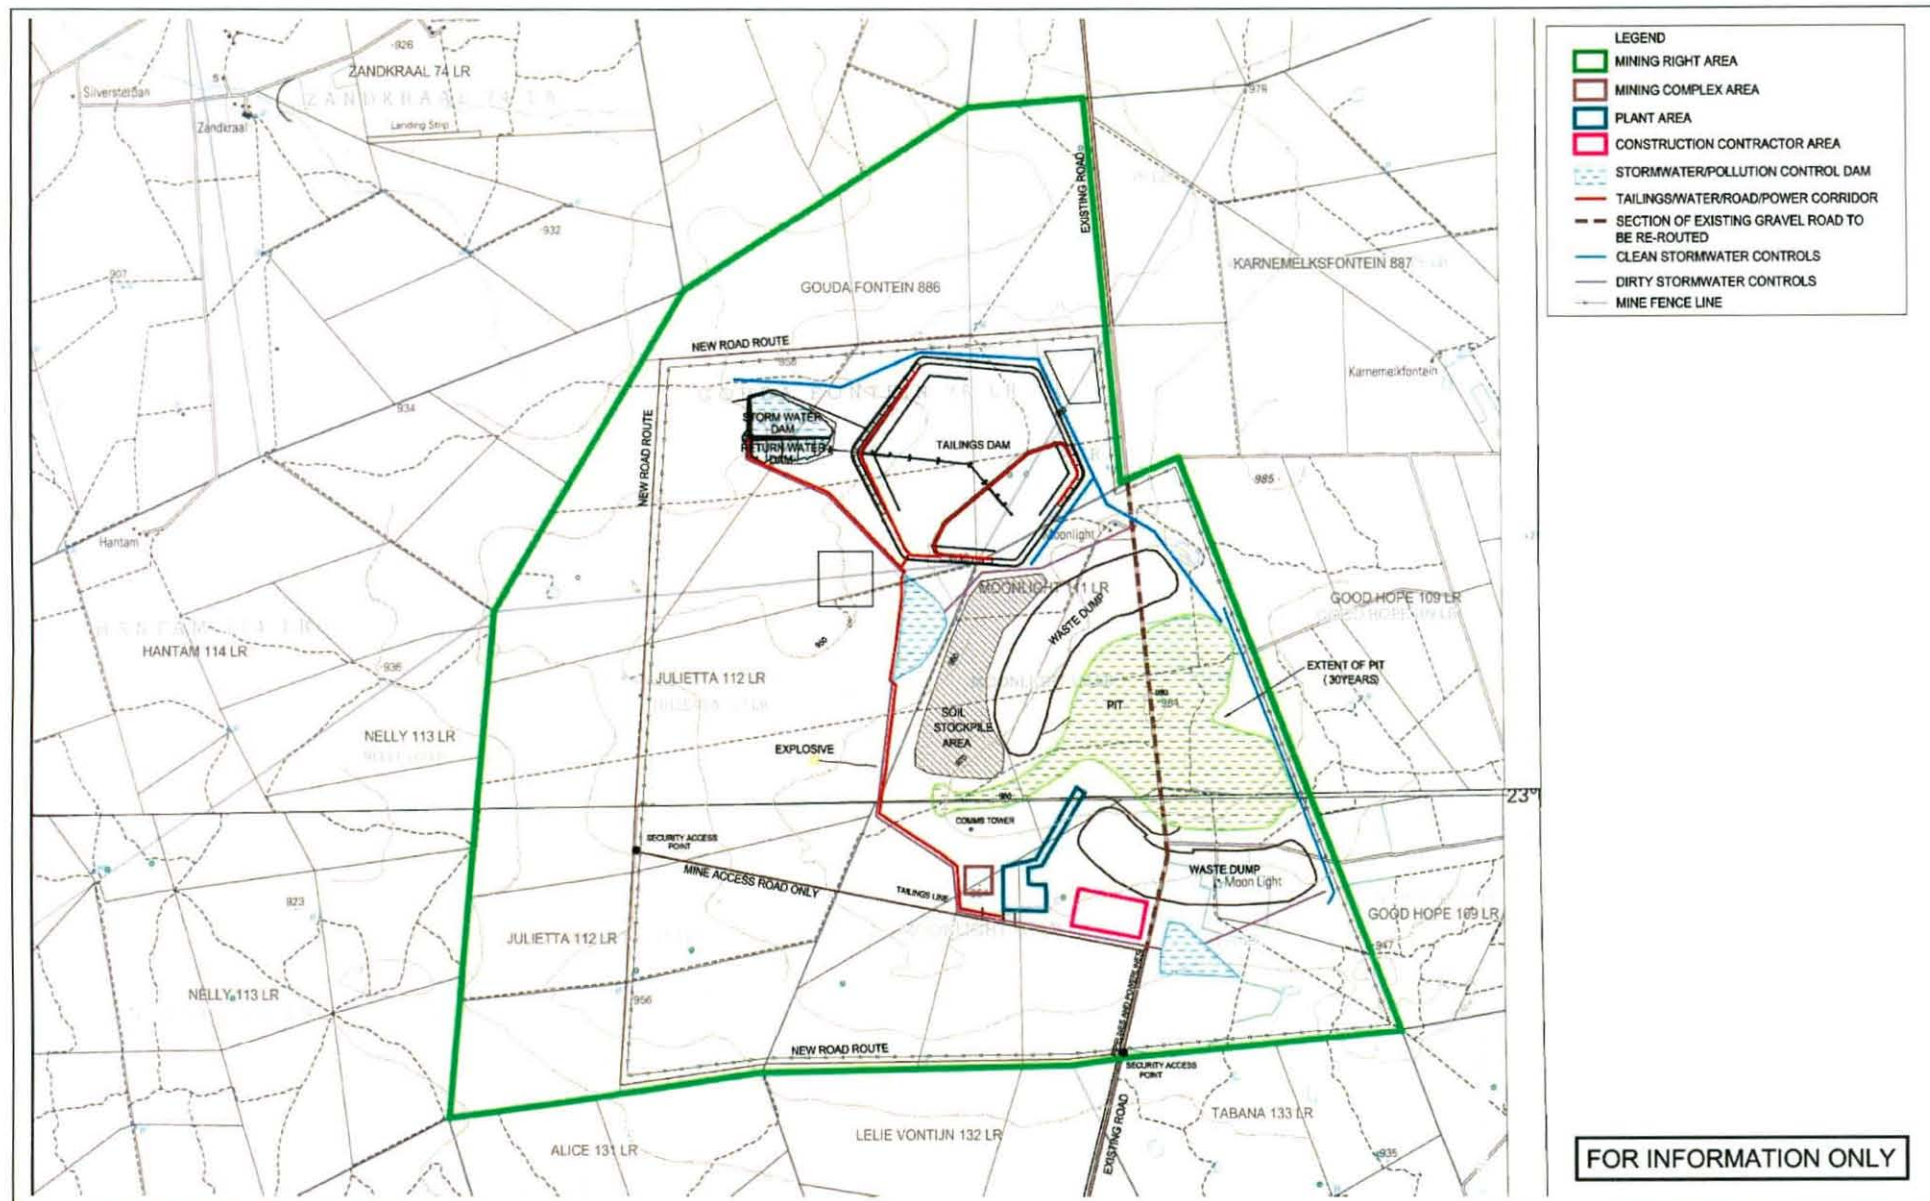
PROPOSED SITE LAYOUT AND ROAD DIVERSION
